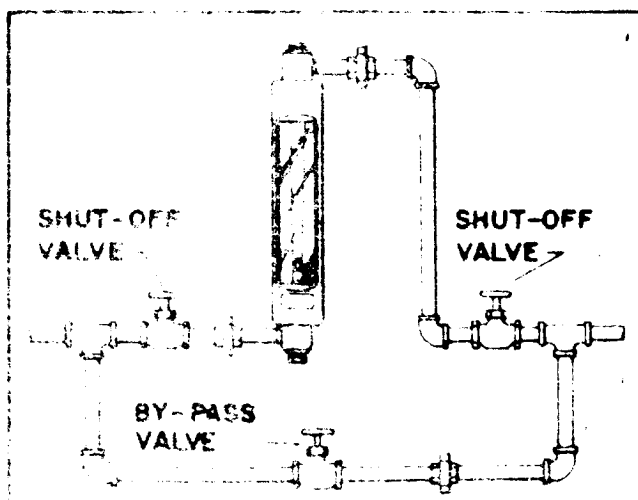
FIG. V. TYPICAL HORIZONTAL LINE INSTALLATION
